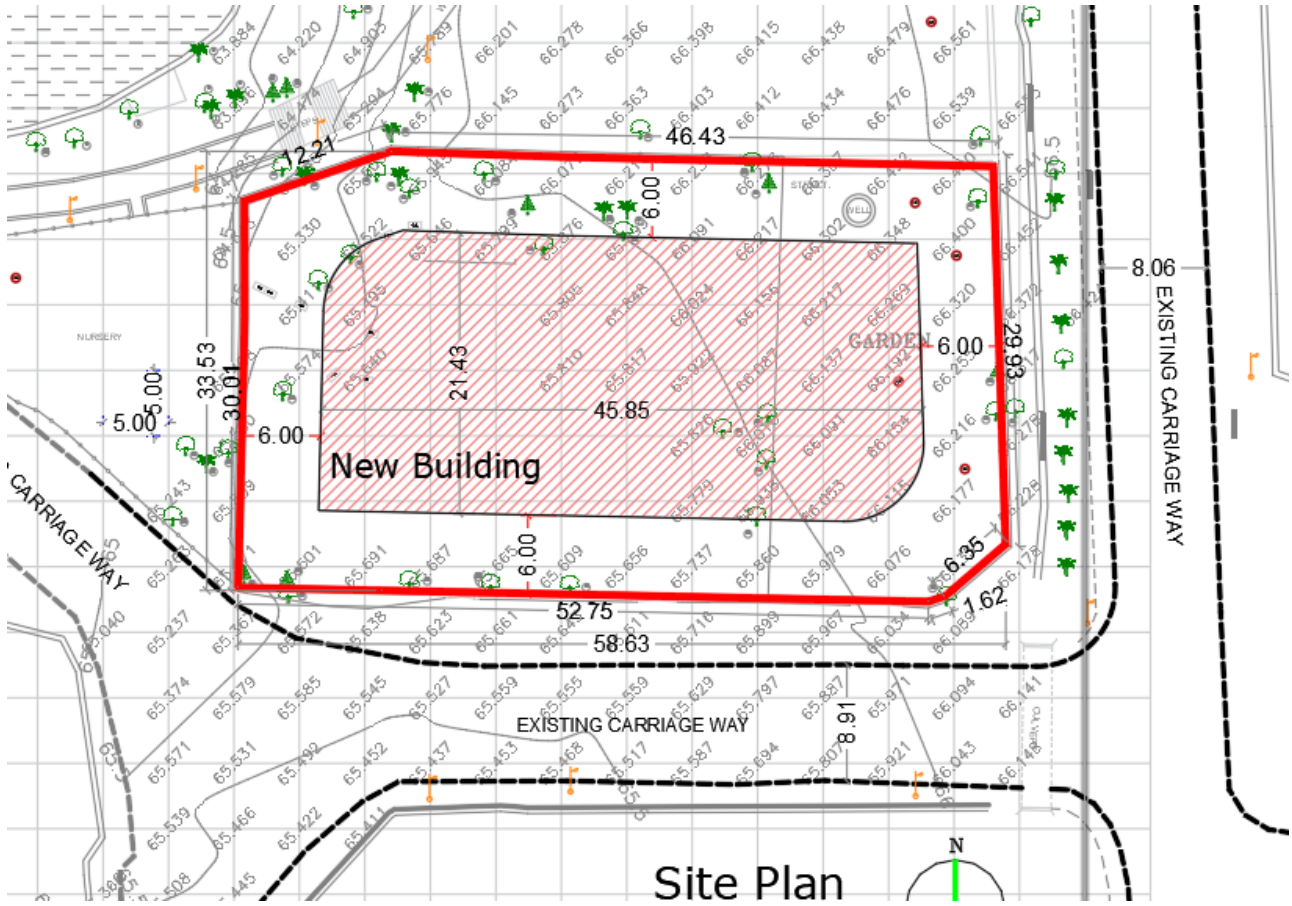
Approximate Building outline (Site area: 1940 SQM)
